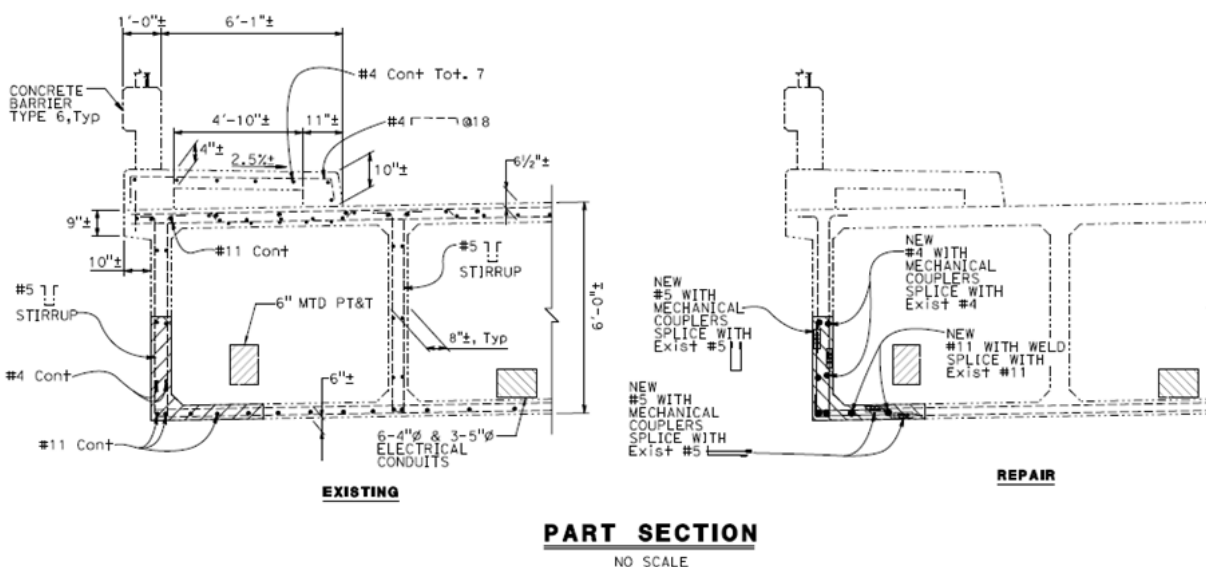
Severe Damage Repair of a Bridge Girder and Soffit
